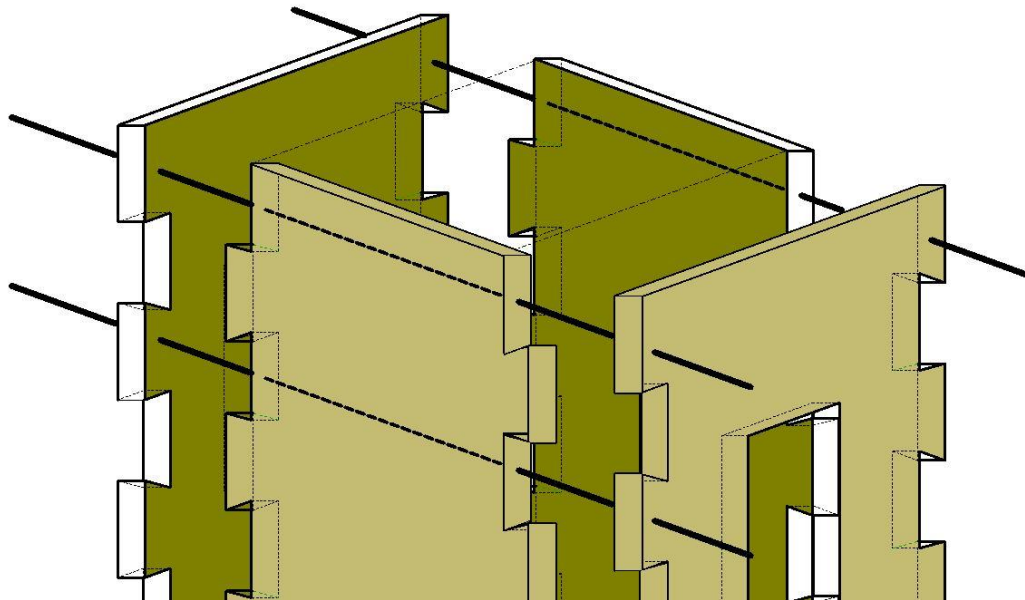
Steel cable penetrating CLT shear wall that pulls all four panels together and provides
